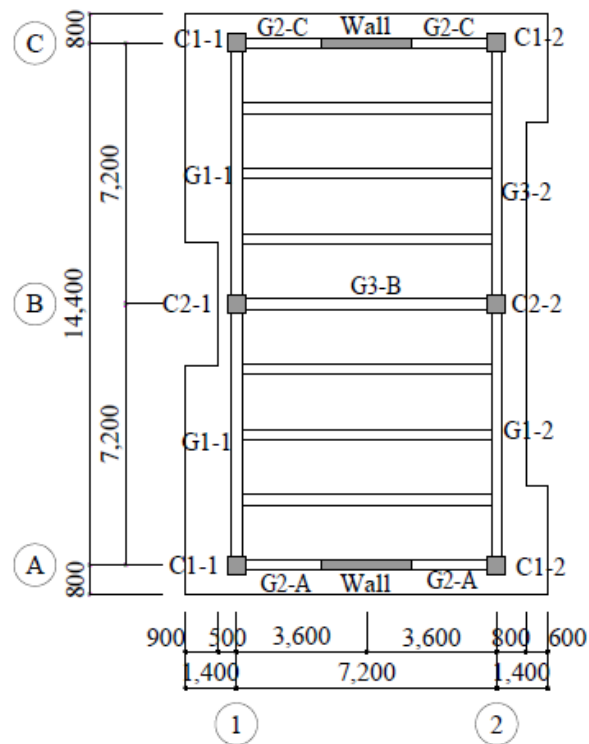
E-Defense RC Building—typical floor plan and member nomenclature (mm).
